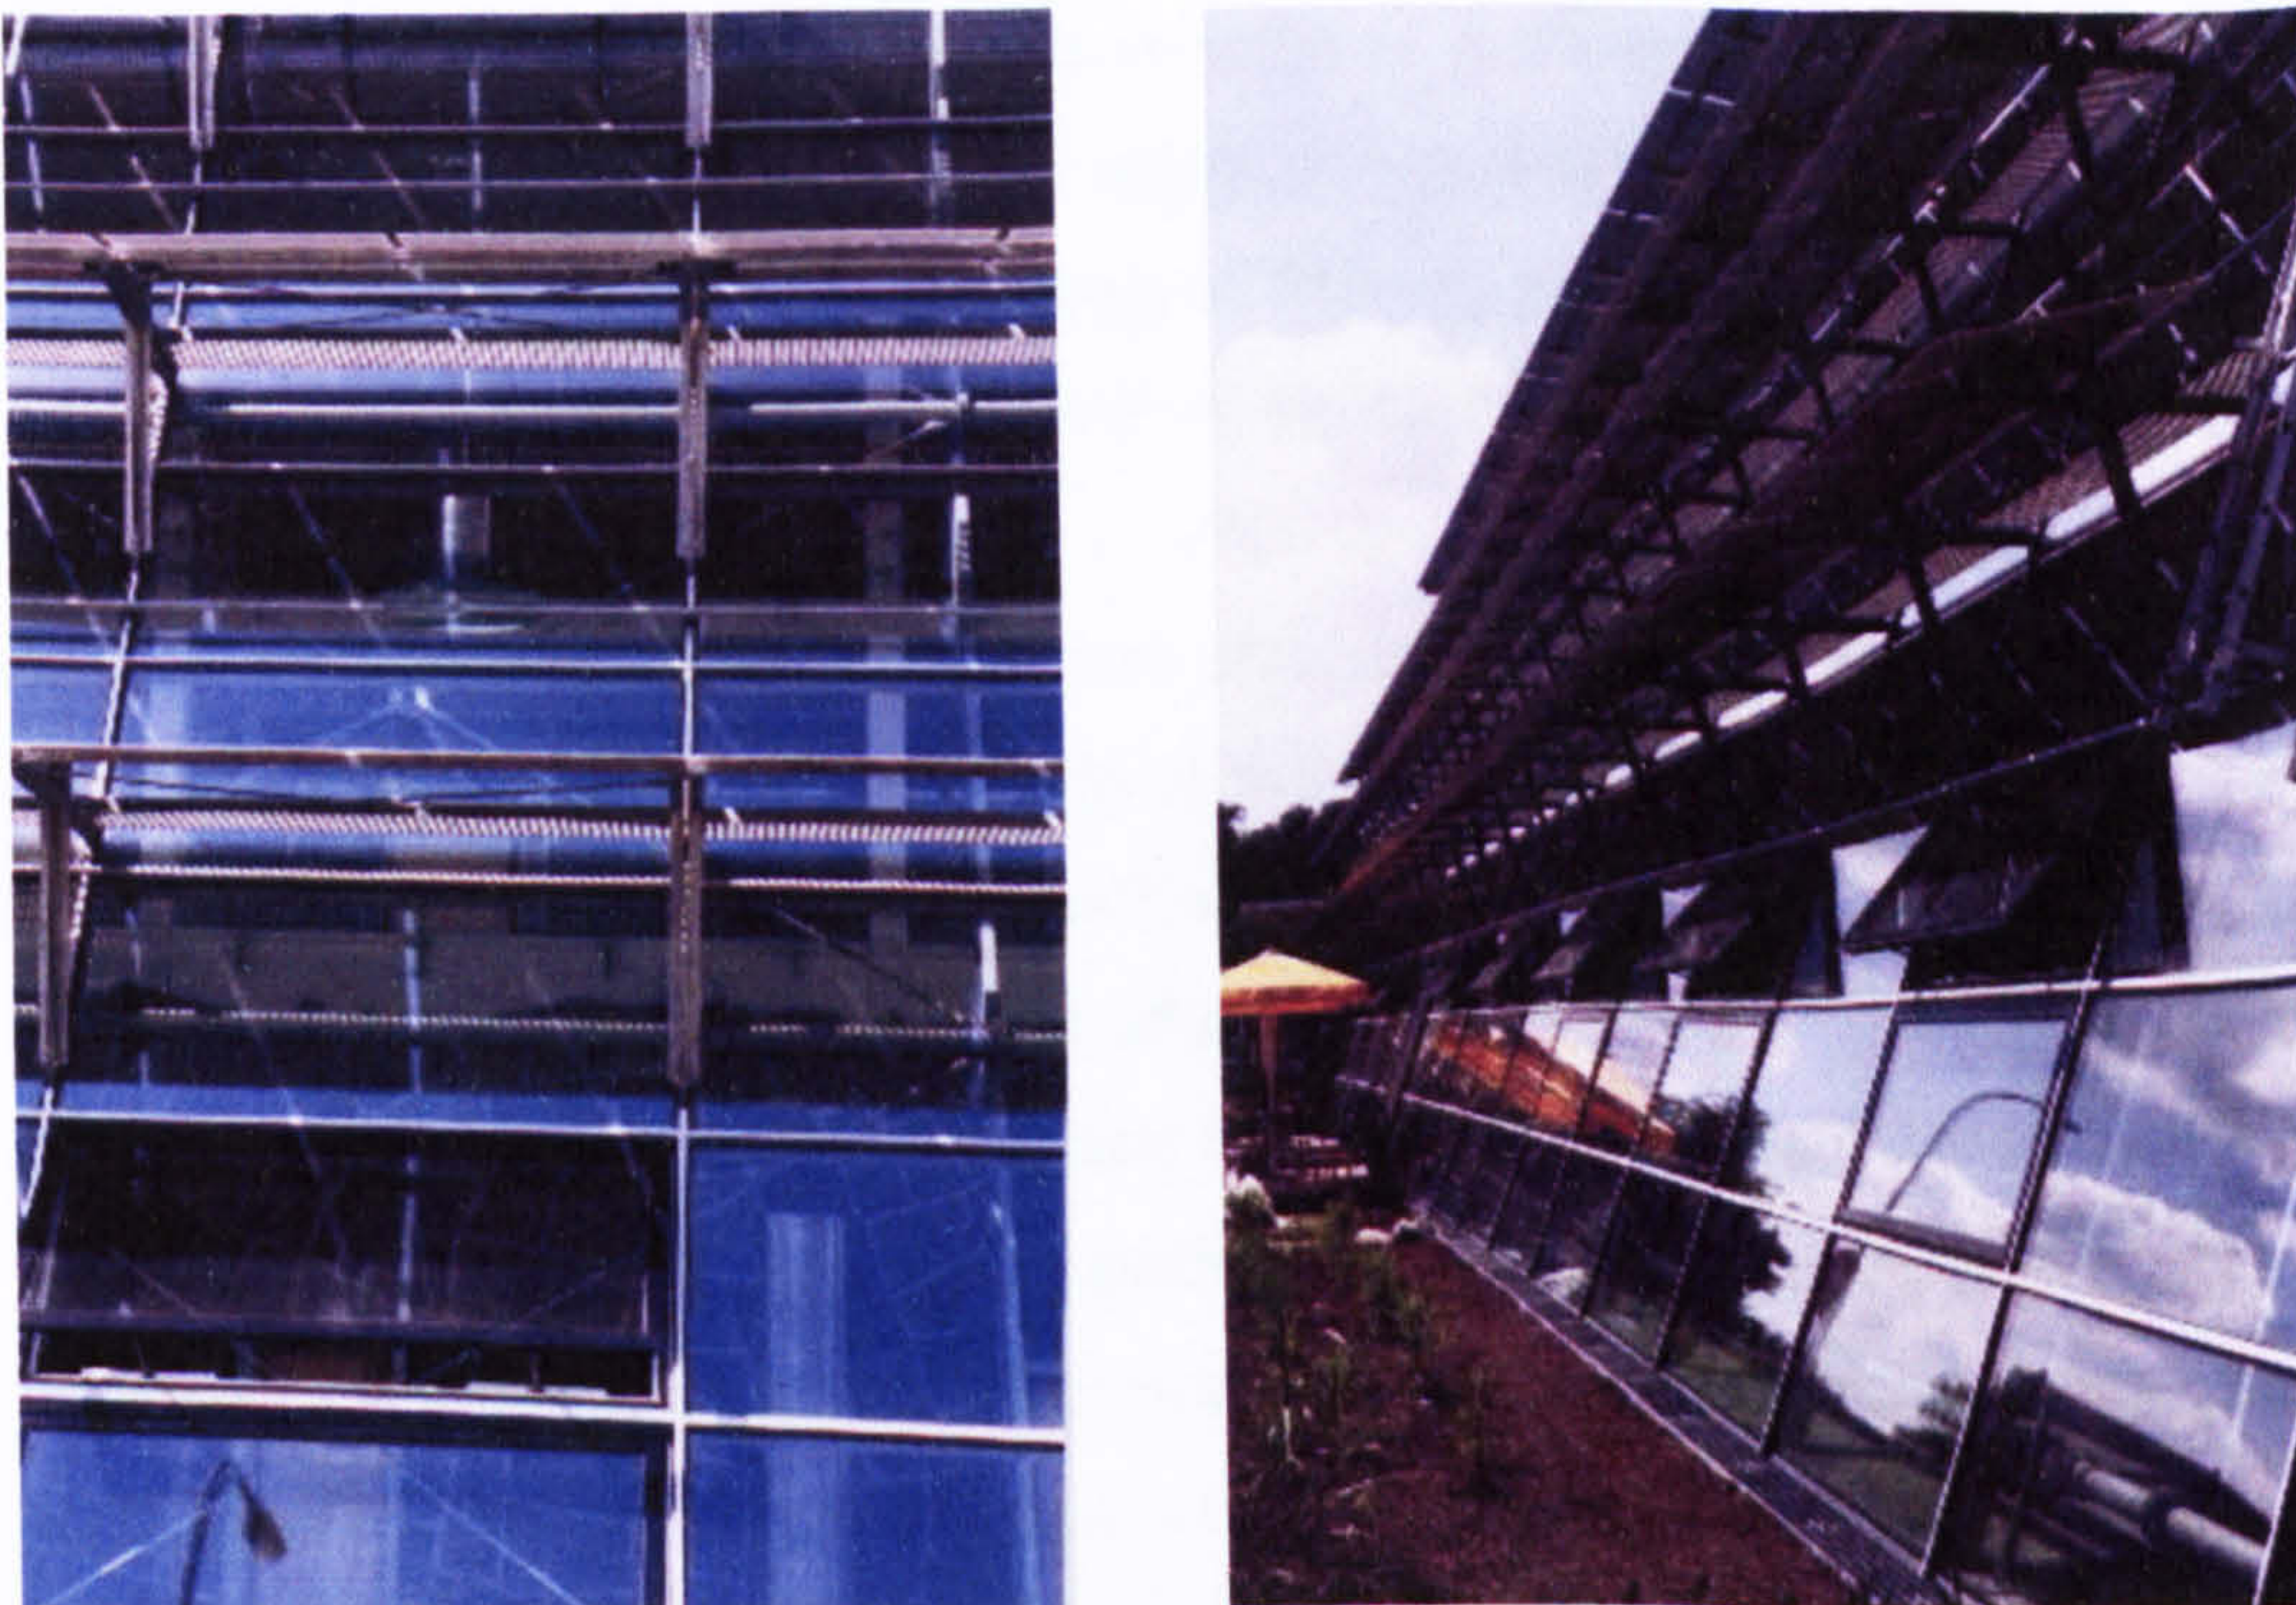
Solar Fabrik building, Freiburg, Germany, south façade
